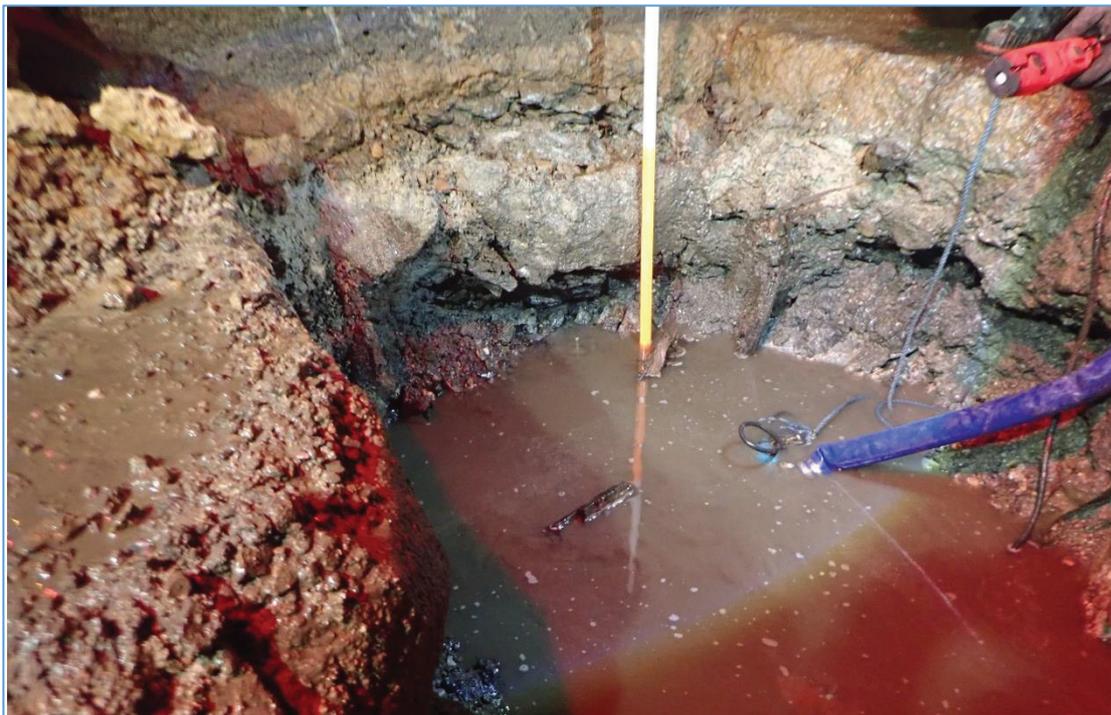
TP-02 at Pier 1. Excavation beneath the concrete revealed the base of stone considered to be associated with the originally plinth of the stone pier, as well as a series of starling piles that lie outside the plinth stones and continue in depth below the excavated levels.
